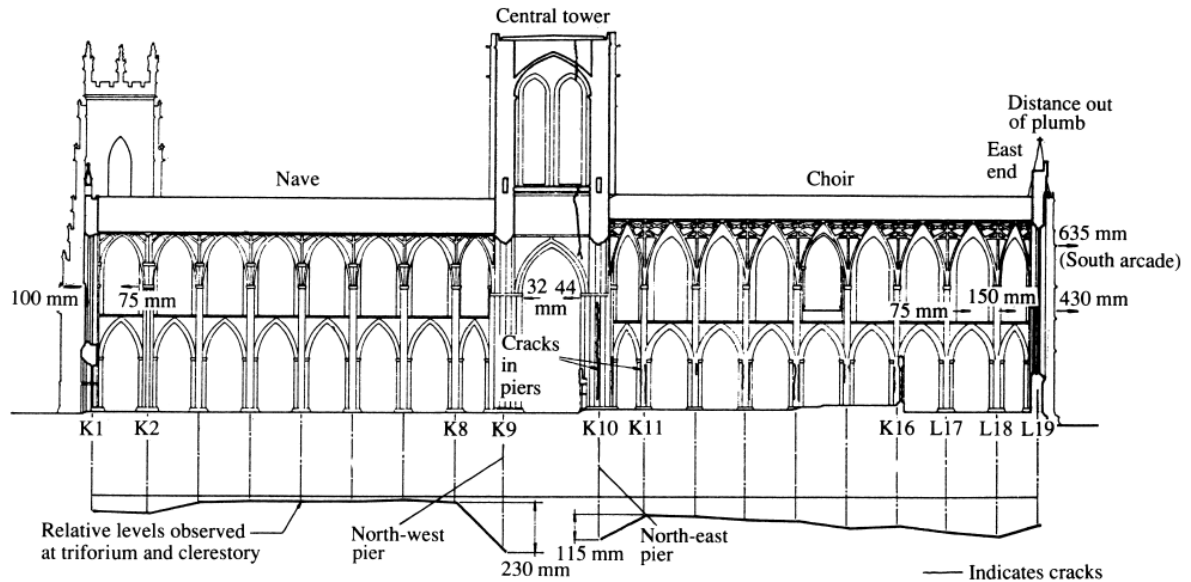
Example of drawing, showing measured and observed defects (from Dowrick and Beckmann, 1971). Measurement of past and ongoing defects is the essential part of an assesment activity.
